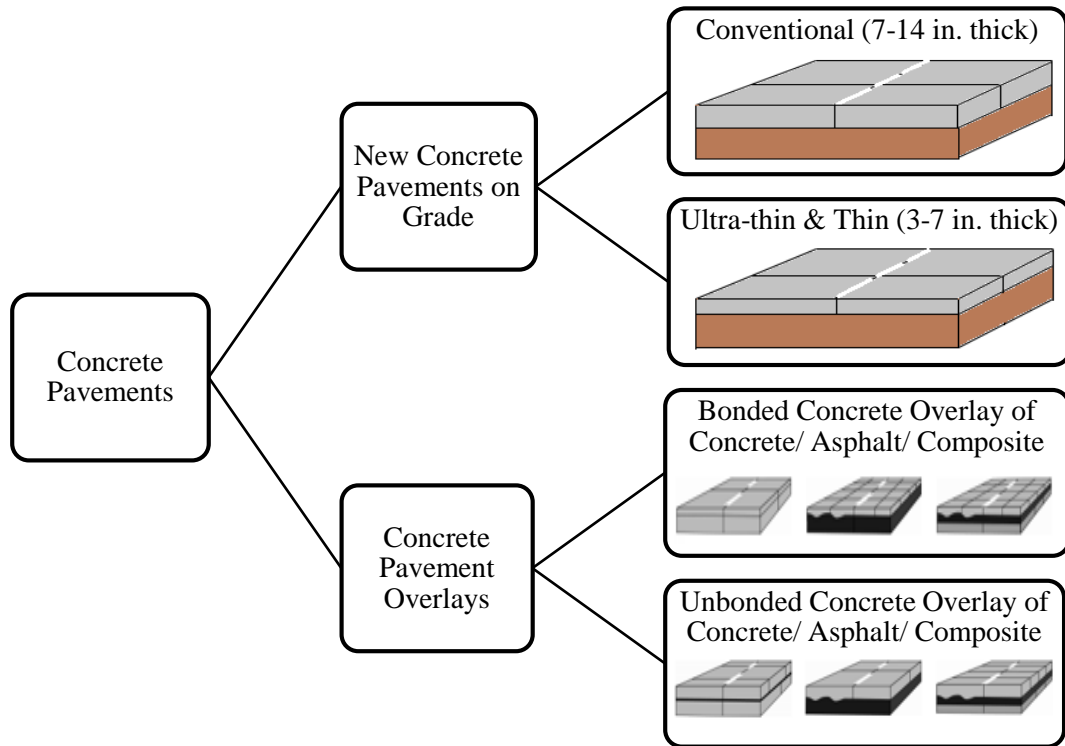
Types of concrete pavements (Overlays image courtesy: Harrington, 2008).
